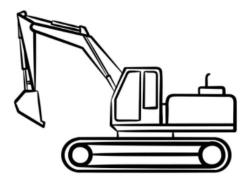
Sketch of a excavator (Schiereck and Verhagen, 2019)
